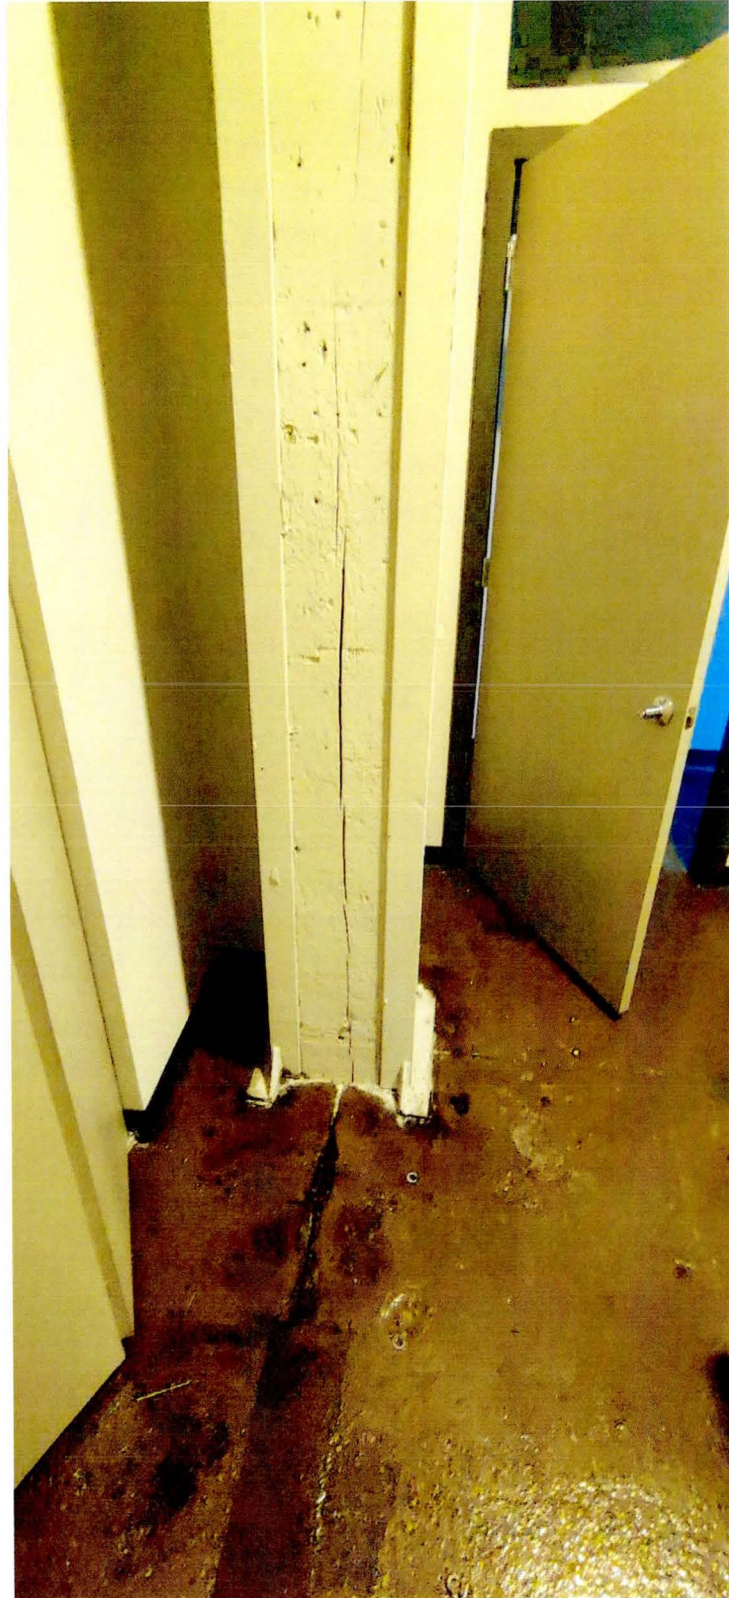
Unit 1036 - Wooden Pillar and cracks in the living room
